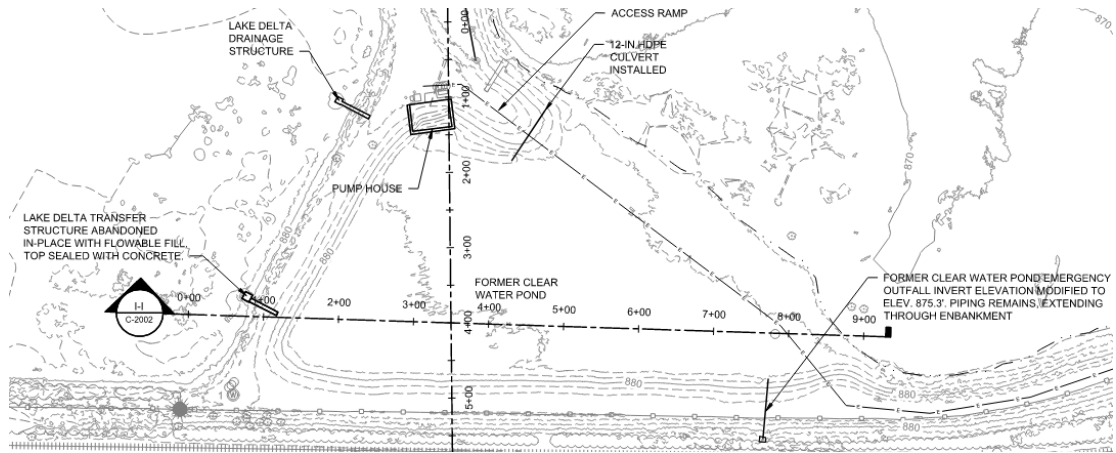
Location of Former Clear Water Pond Hydraulic Structures
